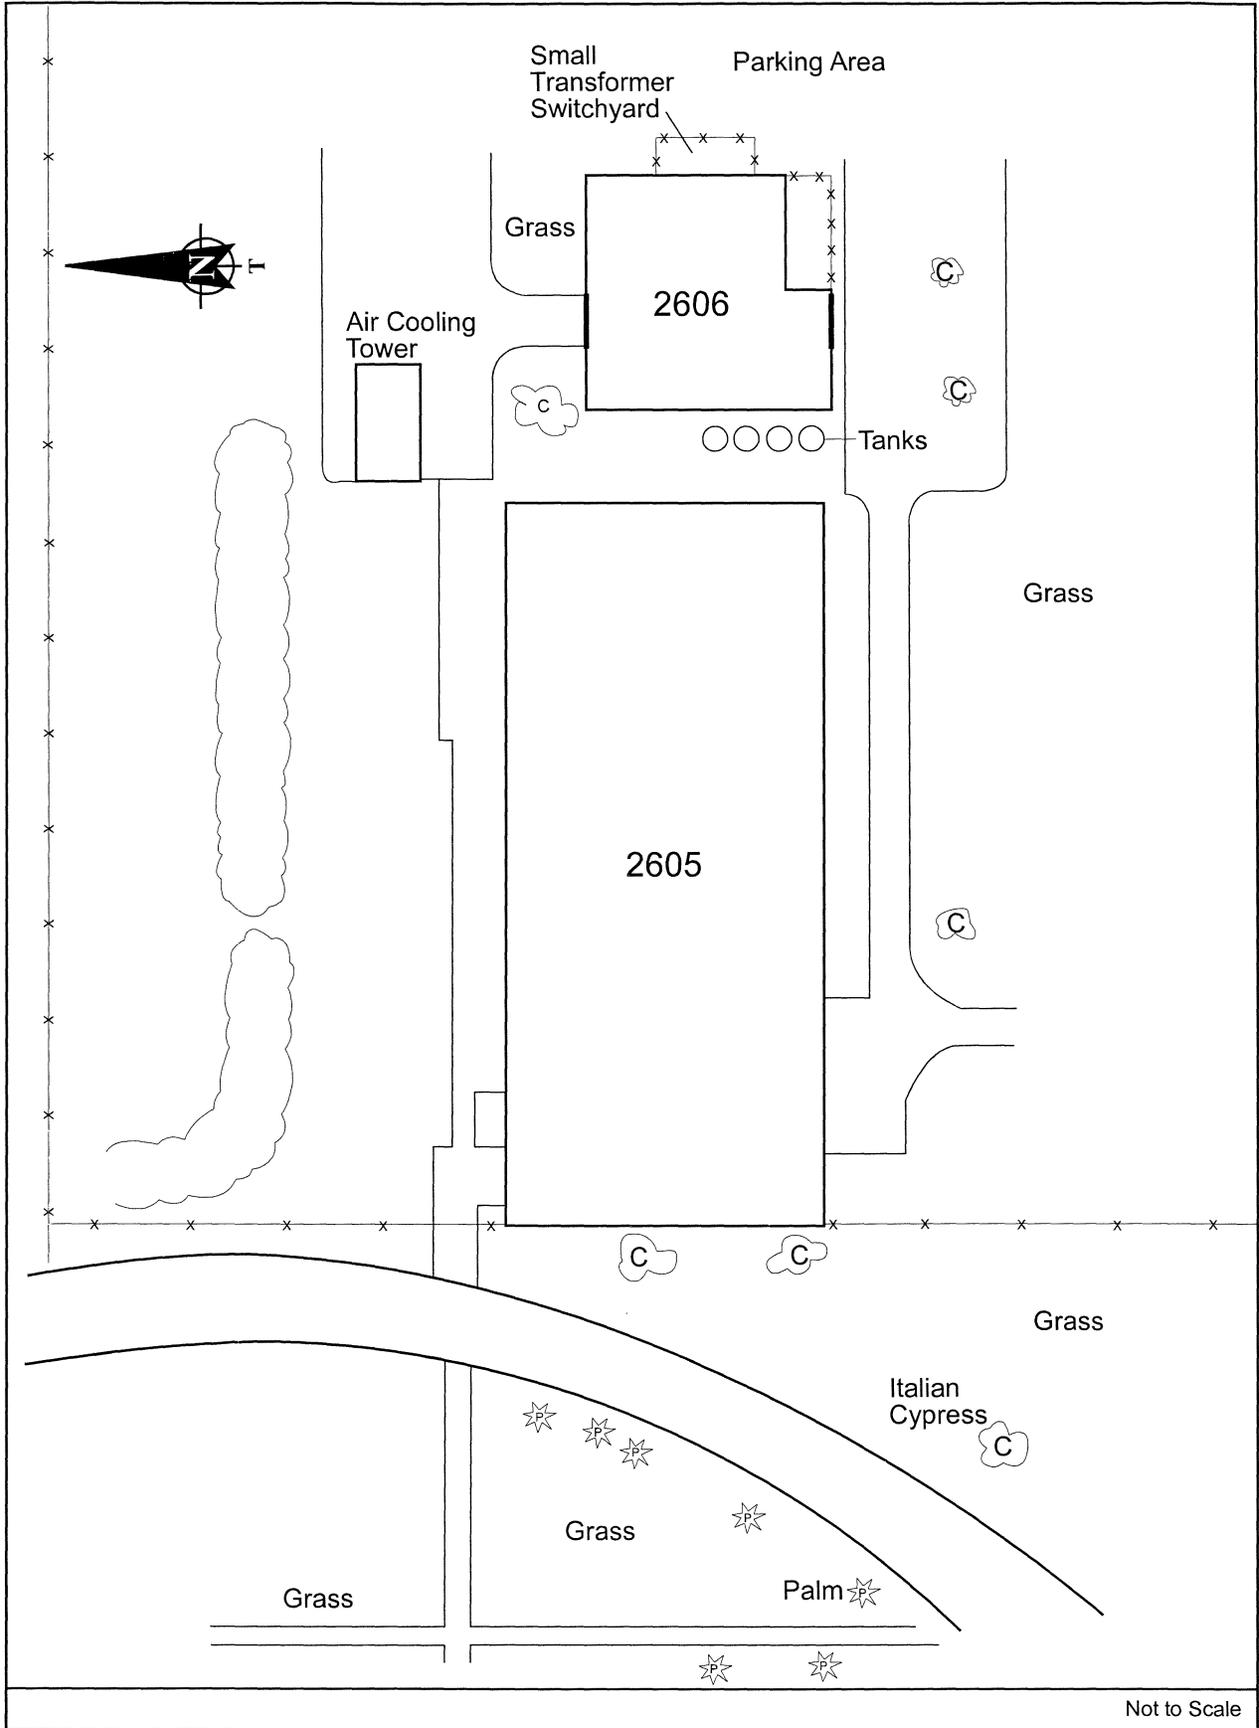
United States Army Reserve, March Air Force Base Site Plan, Building 2606
